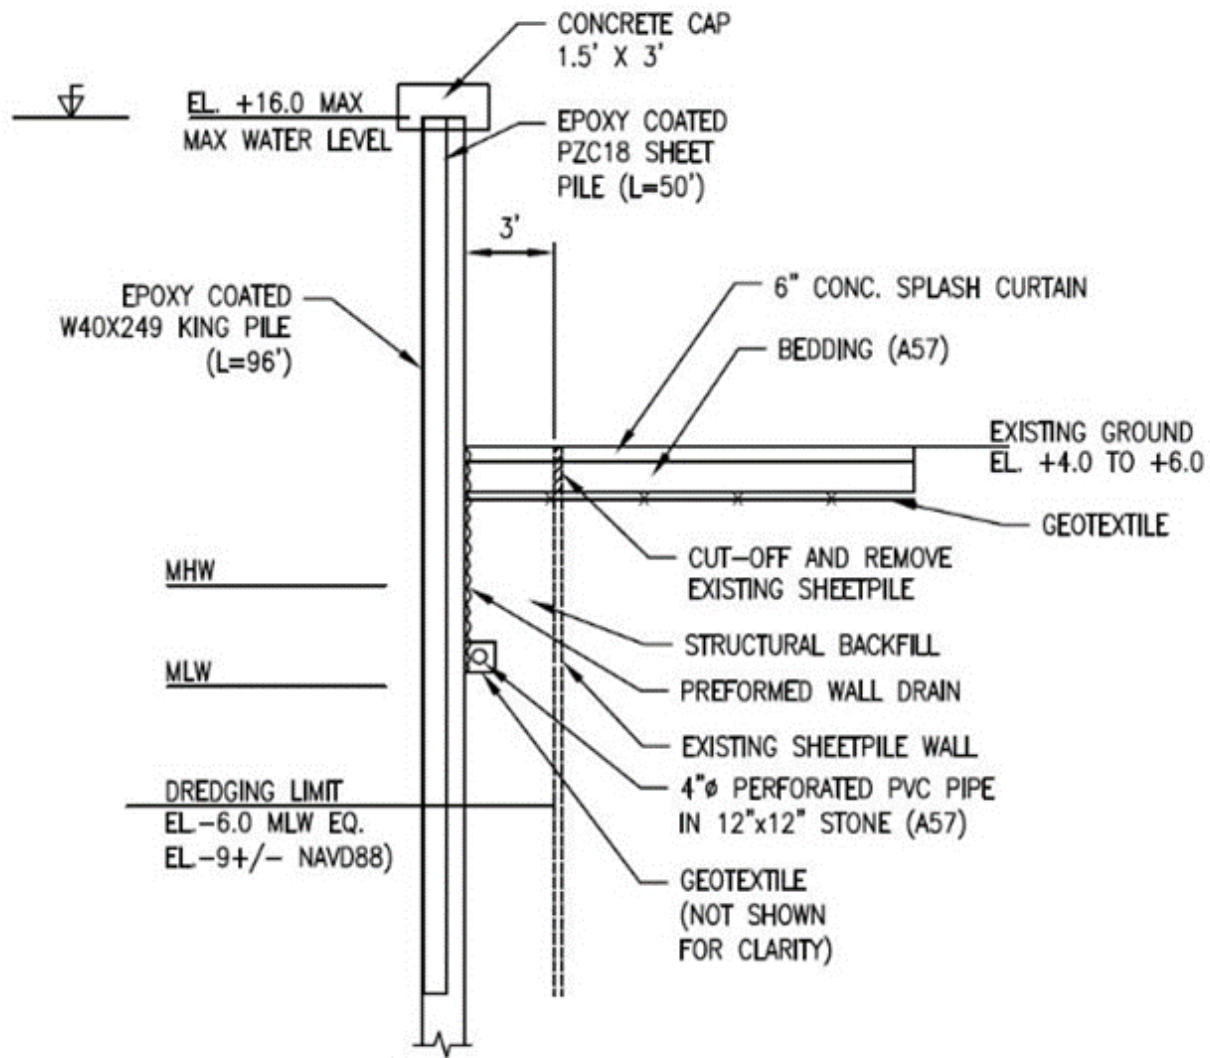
Typical Section Type D King Pile Combined with Sheetpile Floodwall (Perimeter Plans)
